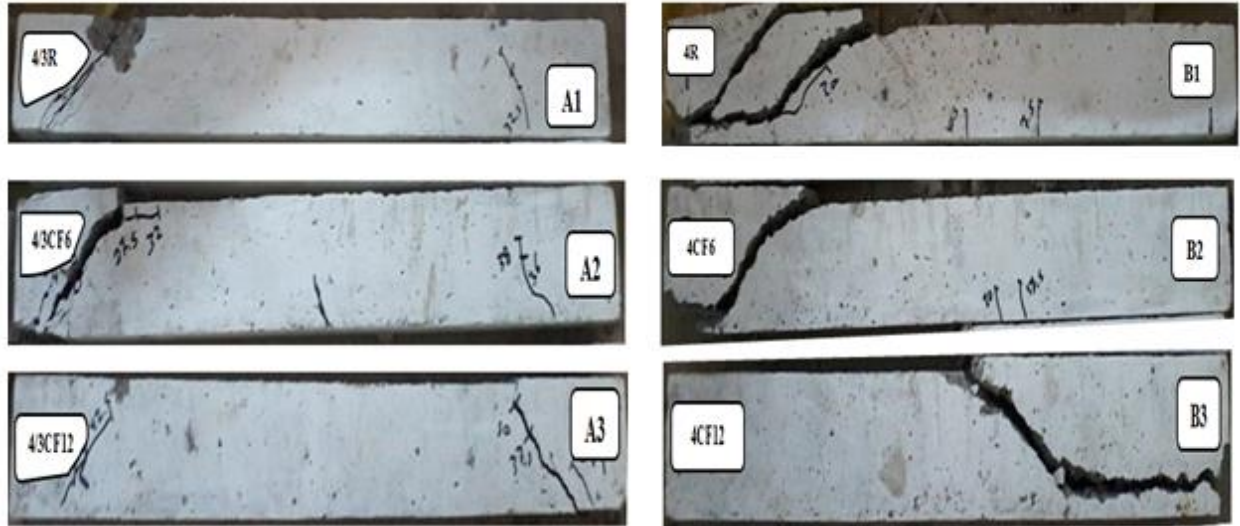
Crack patterns of Specimens beams[A1, A2,A3,B1,B2,B3]
